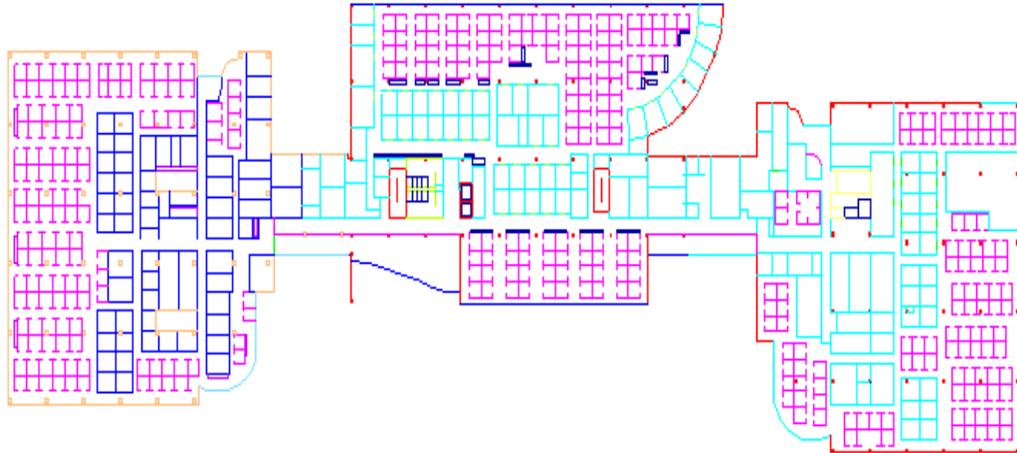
Second Floor Plan for the Mt. Airy Office
